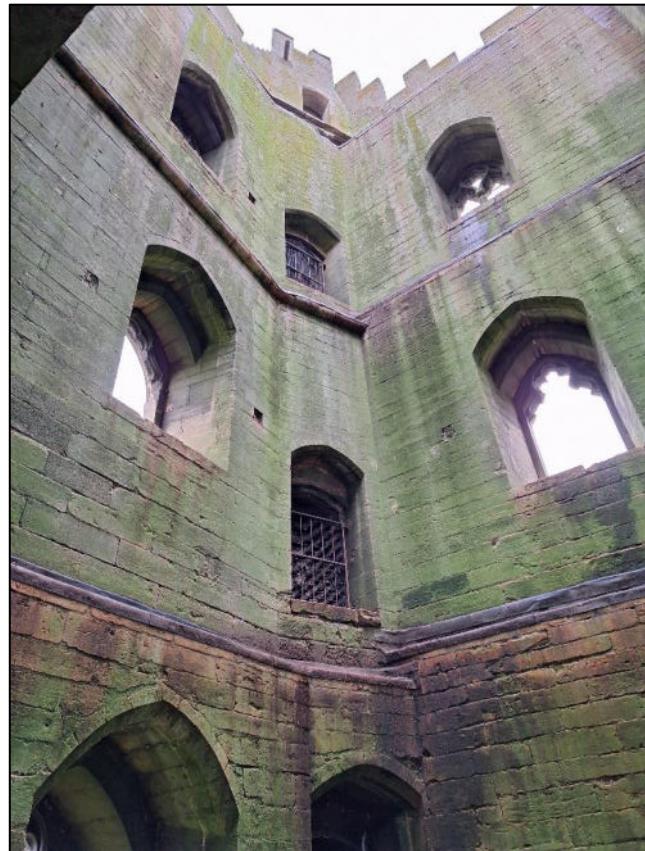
Interior southern and eastern elevations, towards spiral staircase, depicting hollow interior of Kyme Tower.
